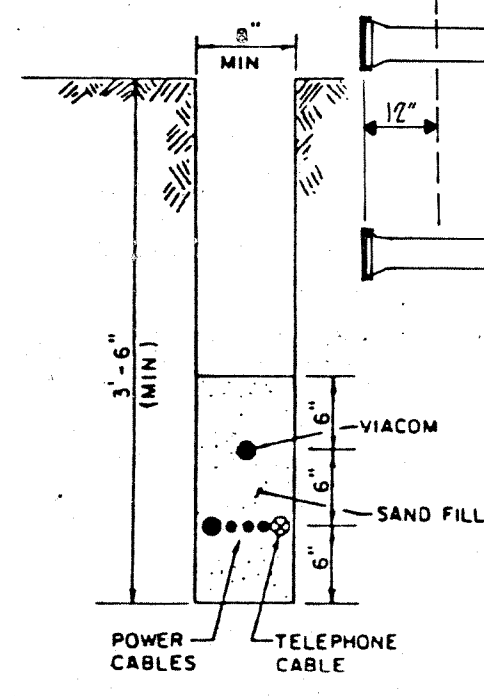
PLAN-PROFILE D. P. R. & E. STANDARD
